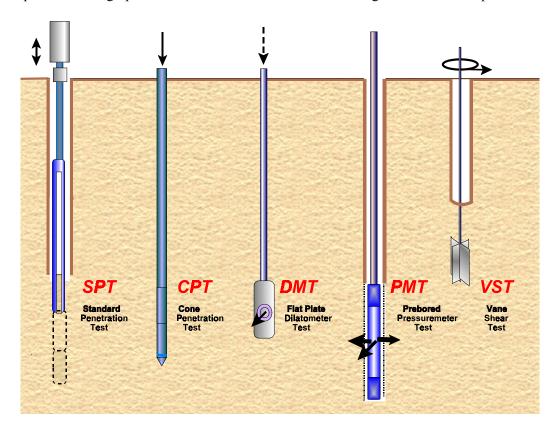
Common In-Situ Tests for Geotechnical Site Characterization of Soils.
